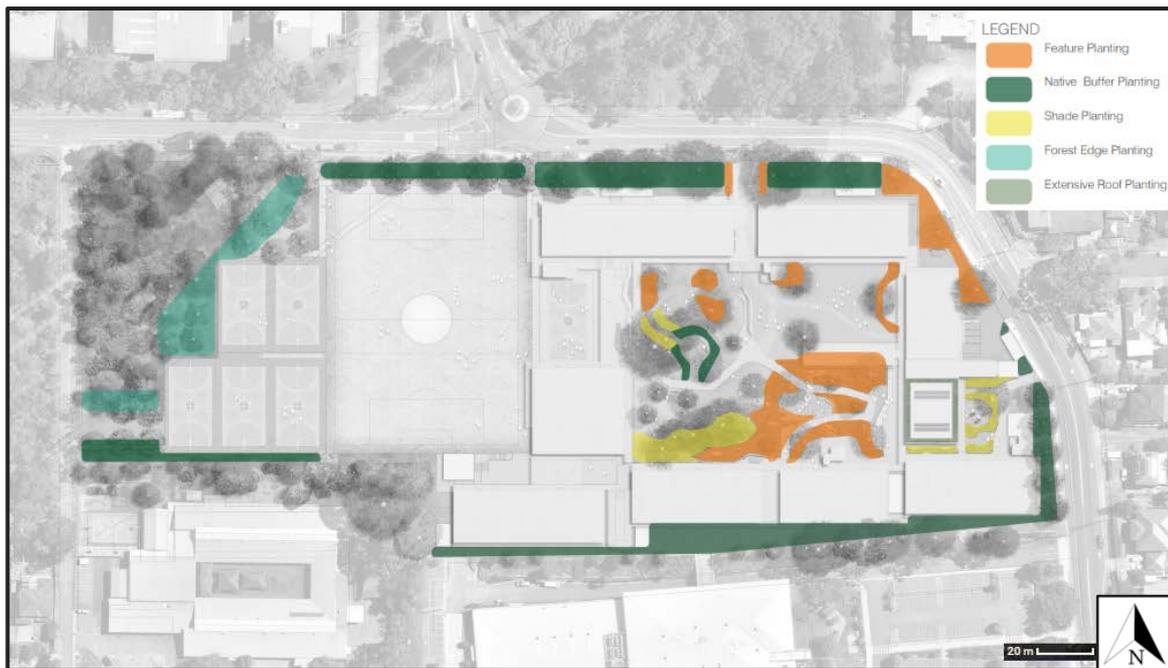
| Proposed planting strategy across the site (Base source: Applicant's EIS)
